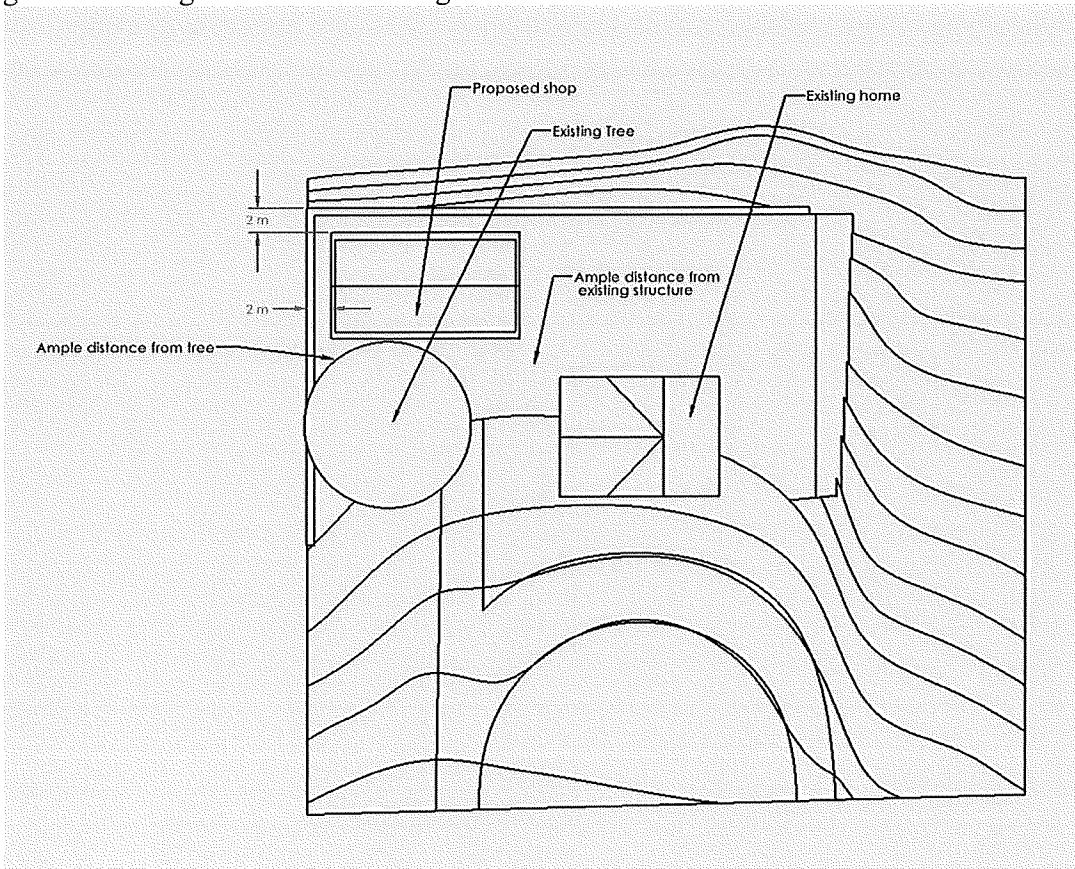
Typical Setbacks (2m from West border, 6m from back border (North))
